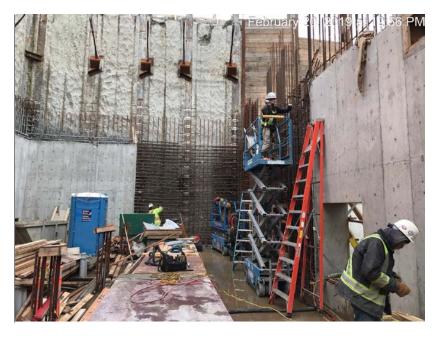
Clover Point Pump Station: electrical conduit and form ties being installed.
